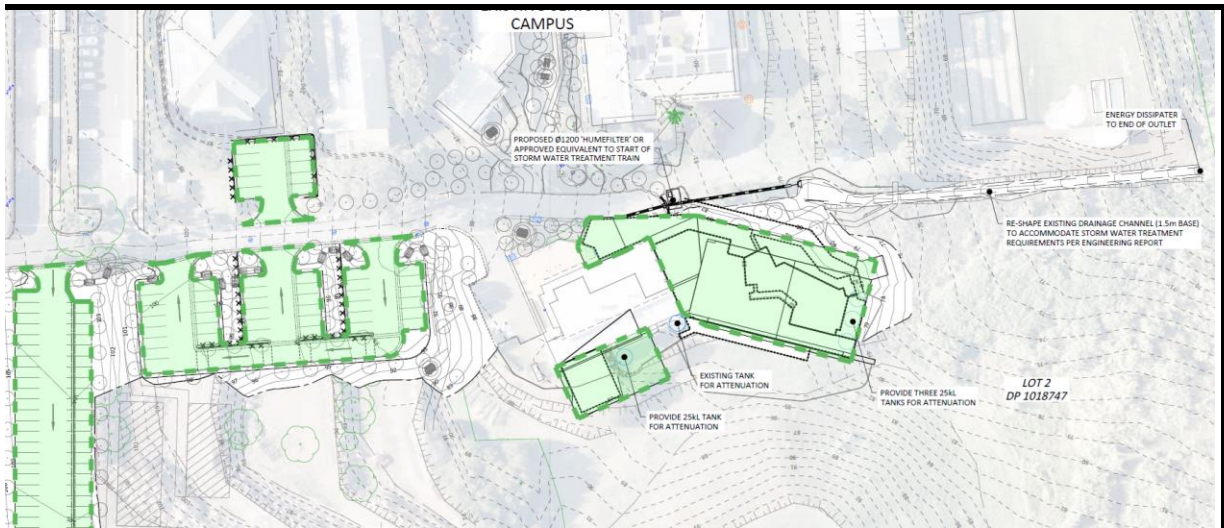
Proposed stormwater Quantity and Quality Measures (Source: Engineering Plans Rev B, NDC, February 2023)
